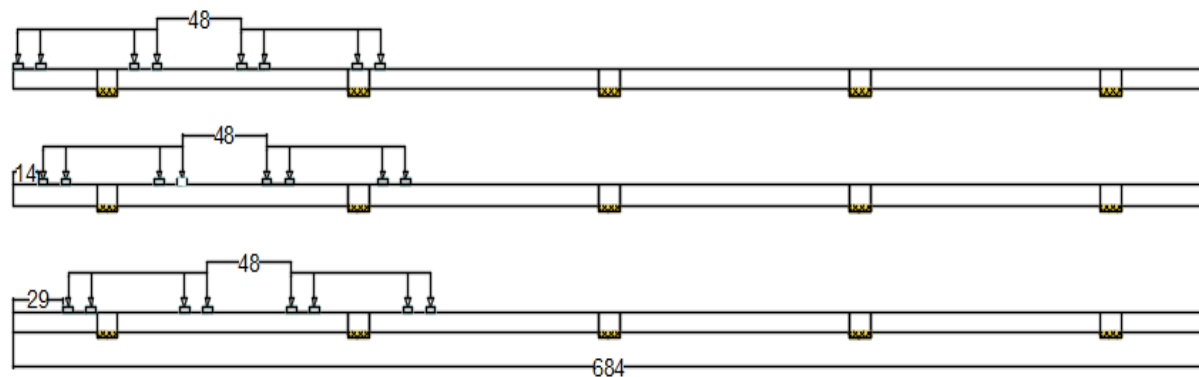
Location of P-15 truck for 12 ft girder spacing deck slab (Case 3, unit: in)
